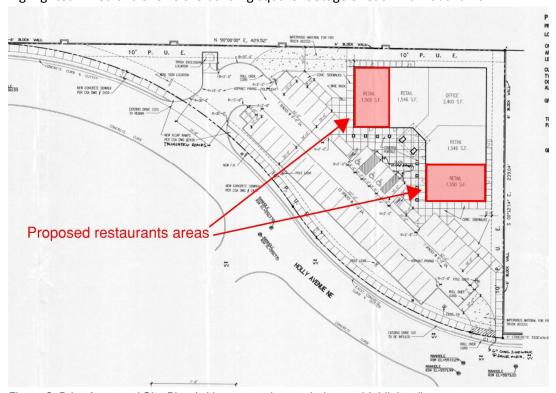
Prior Approved Site Plan (with proposed amended areas highlighted)
